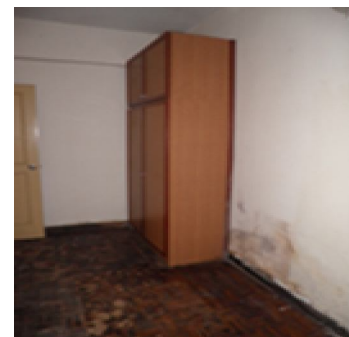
The dampness creating worse scenario of this bedroom with stained wall affecting the wardrobe and floor parquet timber material
